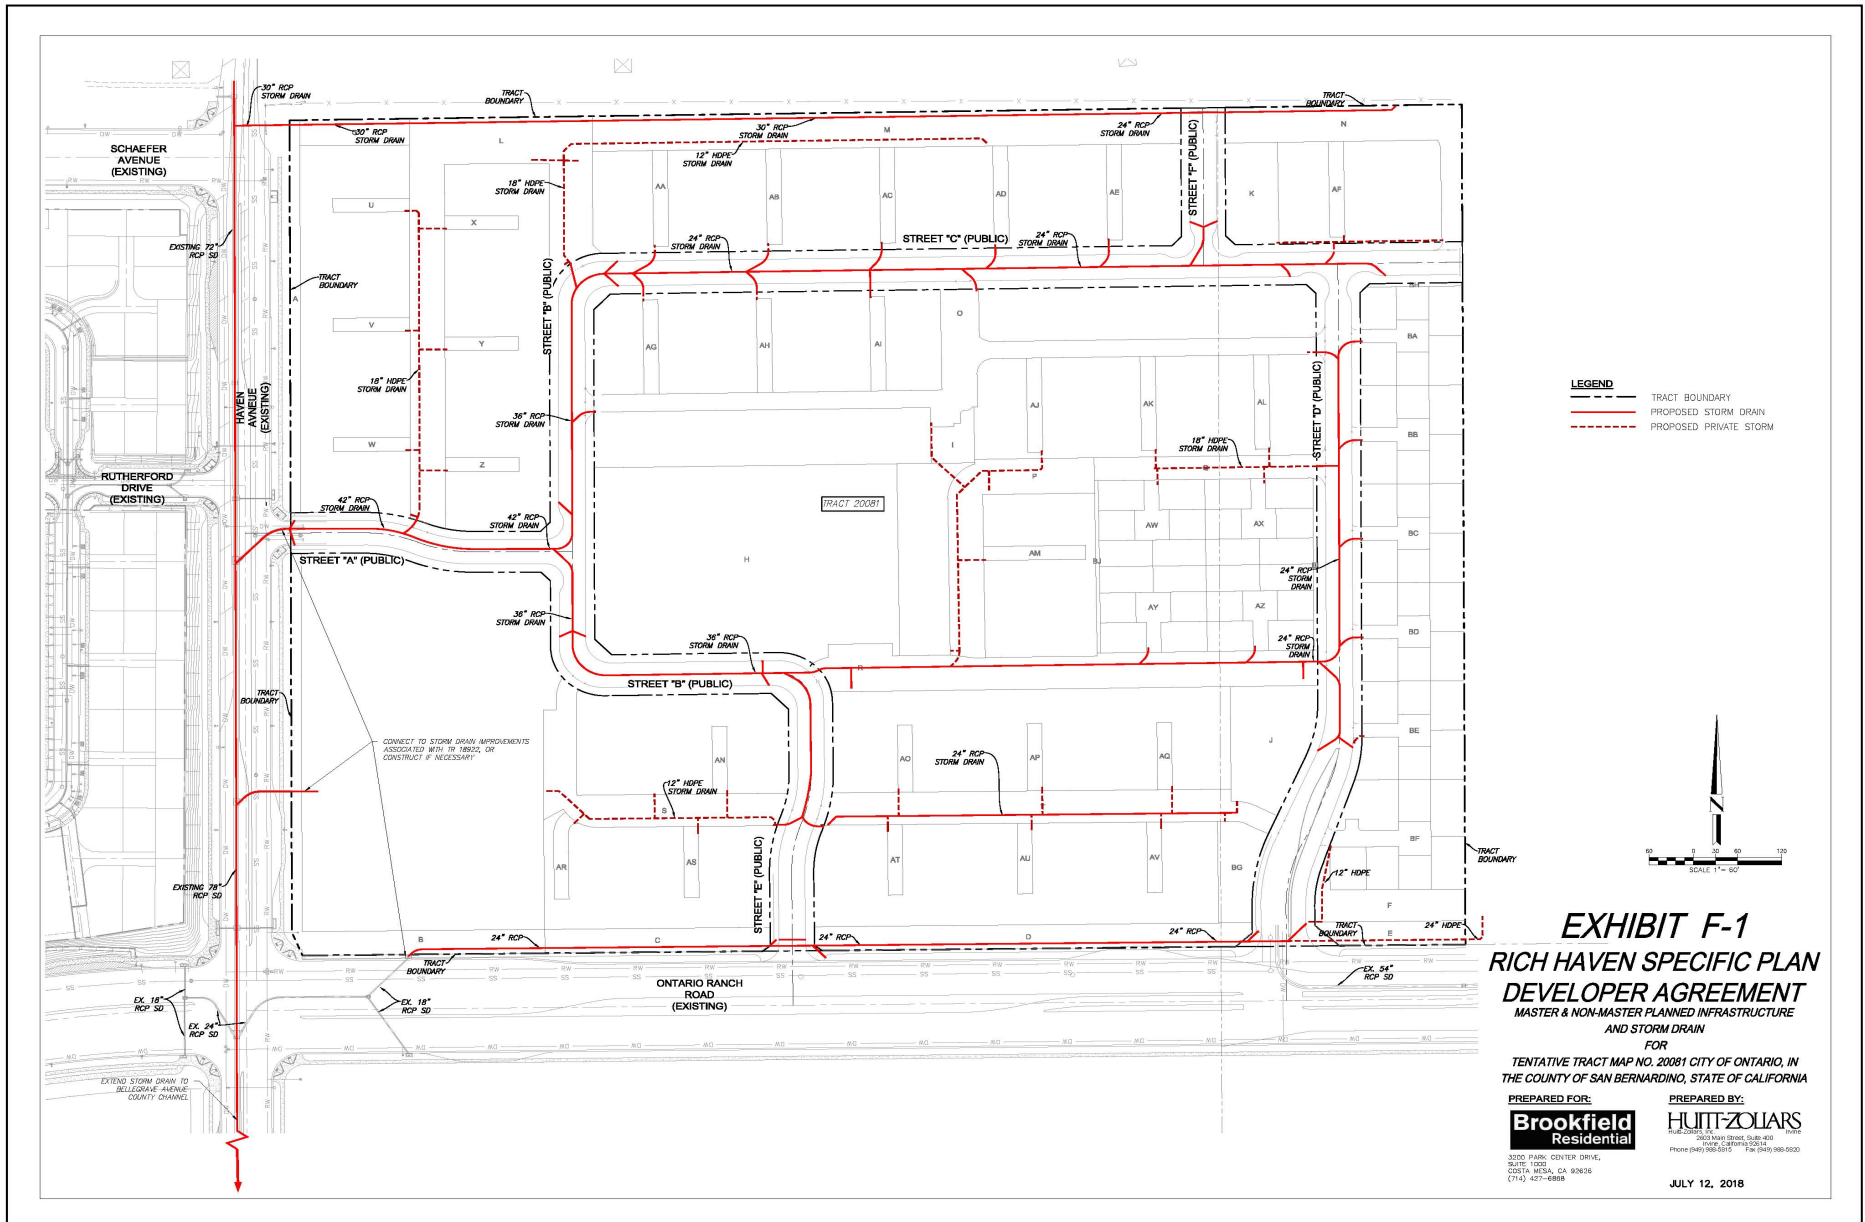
RICH HAVEN SPECIFIC PLAN DEVELOPER AGREEMENT MASTER & NON-MASTER PLANNED INFRASTRUCTURE AND STORM DRAIN
